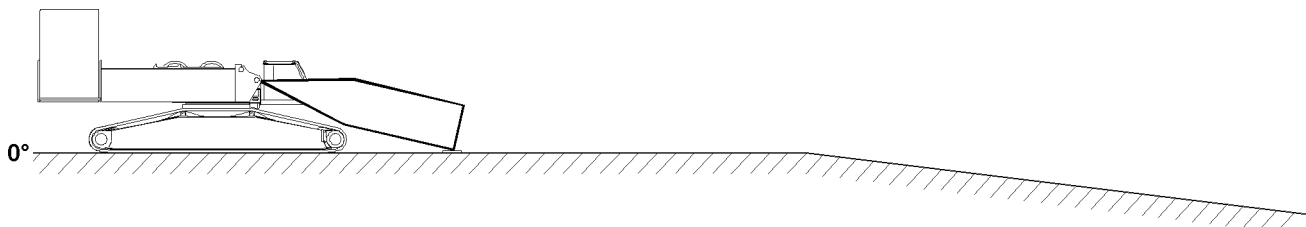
Disassembling and removing the boom - intermediate sections to the boom - pivot section
